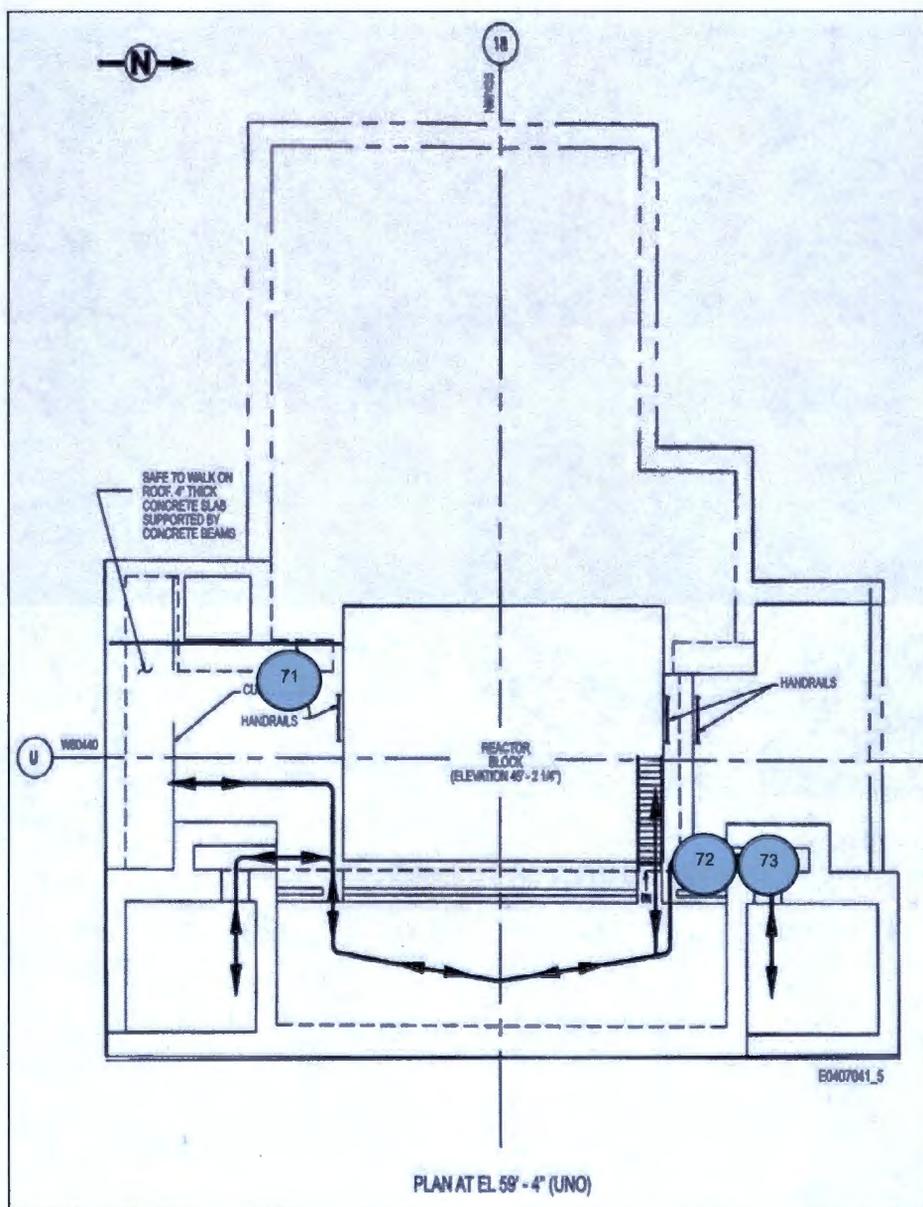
ISS & Original Building Details - Elev. 59'-4".
